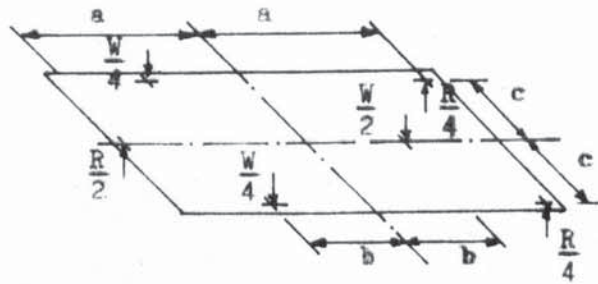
Testing rig used to produce uniform uniaxial bending
